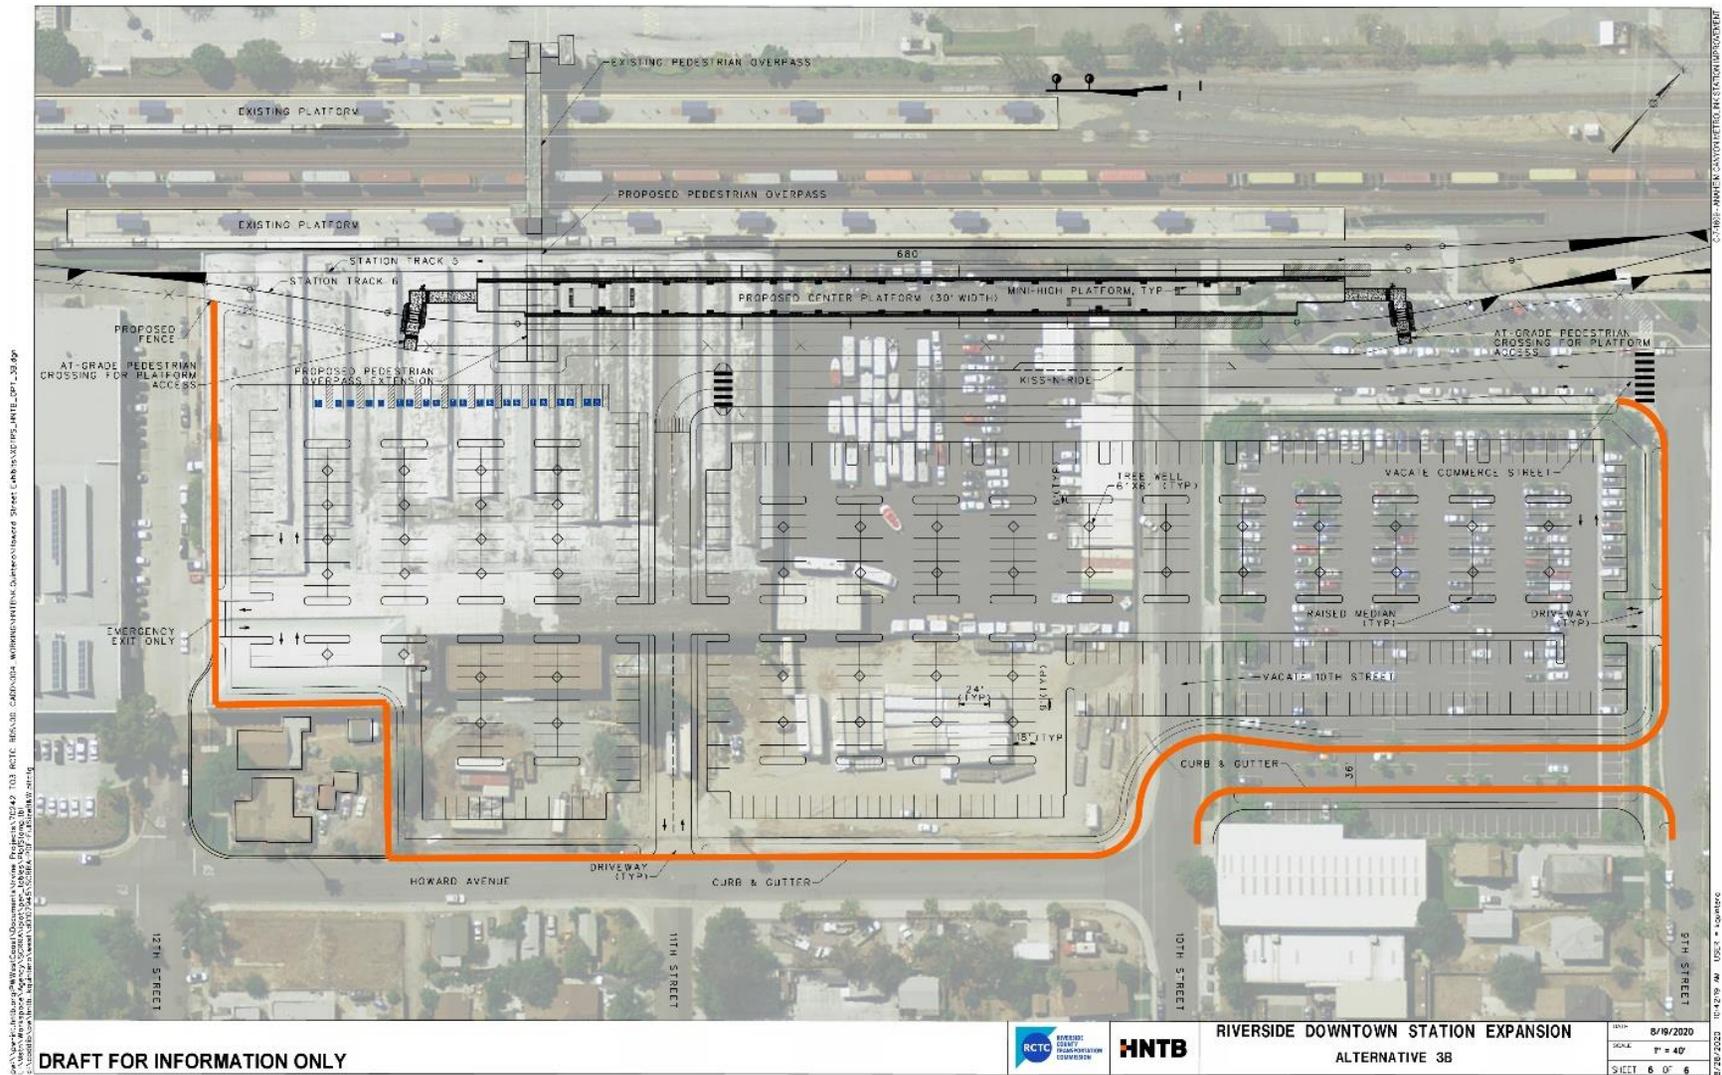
Build Alternative with Traffic Circulation and Parking Option 3B
